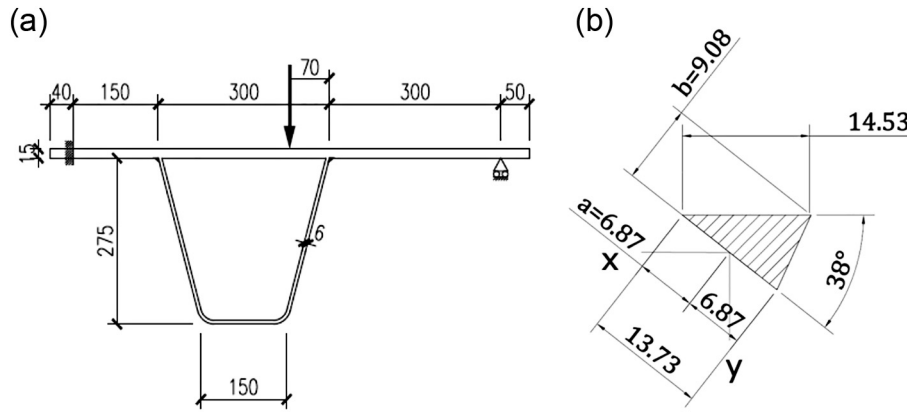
a) Geometry OSD-specimen [17] b) Weld geometry.
